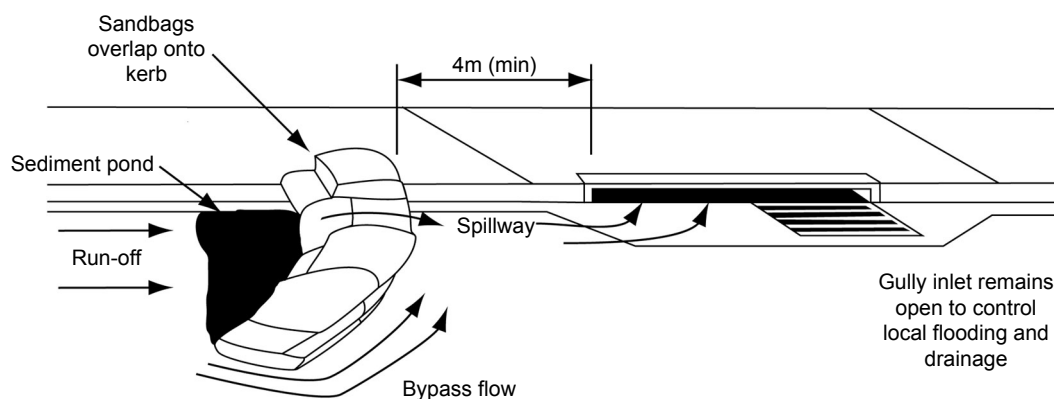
On-grade gully inlet sediment trap suitable for use on a closed road
